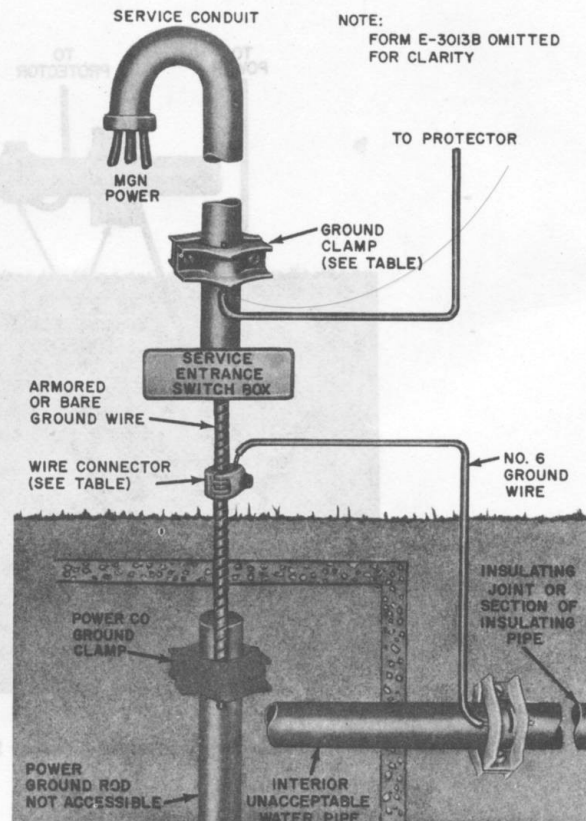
MGN Power Grounded to Inaccessible Ground Rod—Unacceptable Interior Water System
